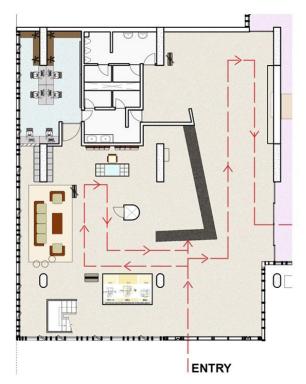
Proposed layout of Orientation Gallery on the Ground Floor of the Museum
